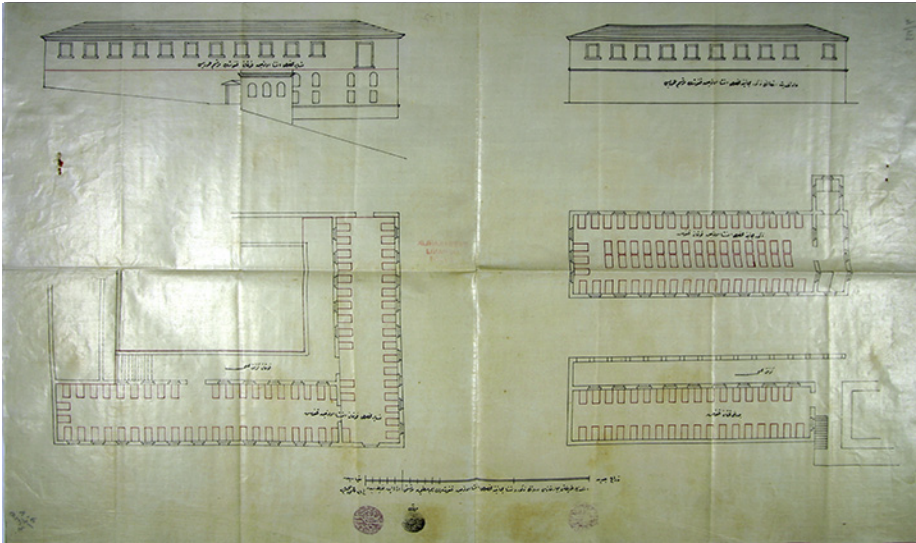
1893 Expansion Project. Drawing showing: Top left: Elevation of the female section (E), Bottom left: Plan of the second-floor addition of the female section (E), Top right: Elevation of a new male section (L), Bottom right: First and second floor plans of a new male section (L). Source: BOA DH.MKT. 19/37,06 Z 1310 (21 June 1893).
